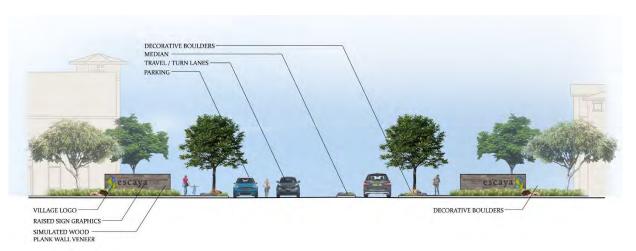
Secondary Village Entry Concept Plan (Santa Maya@ Heritage Road)
